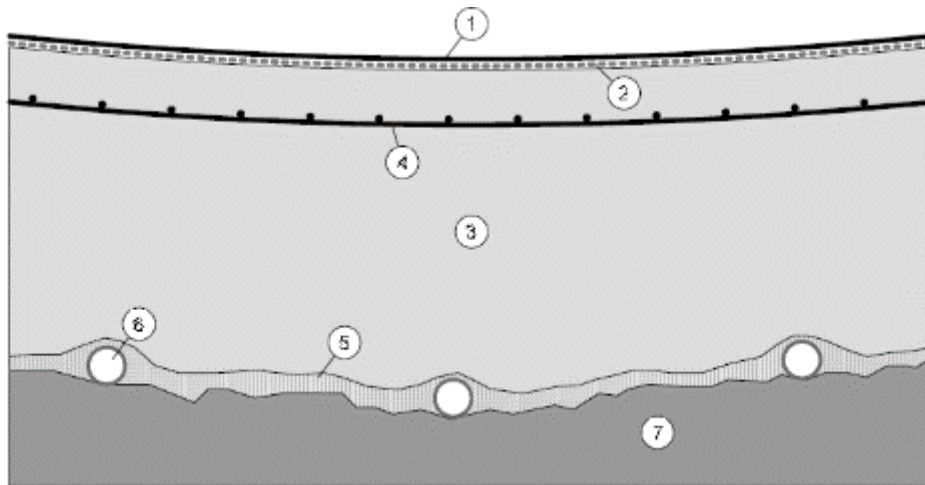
Typical lining + reinforcement configuration used for LNG storage from [44]
